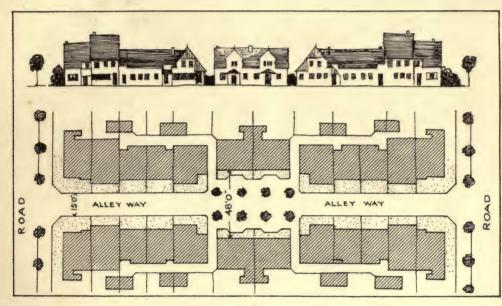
ENLARGED PLAN OF AN ALLEY-WAY
